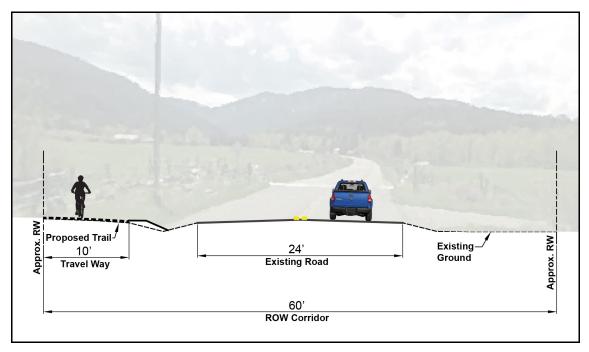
Hyalite Canyon Road looking north (typical section S1-c)
